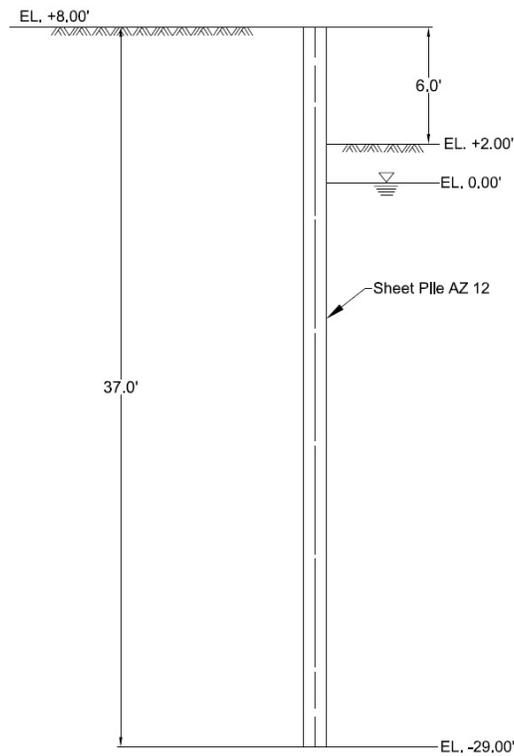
Cross-section of 6 feet Cantilever Sheet Pile Wall for Soil Areas 1 to 3
